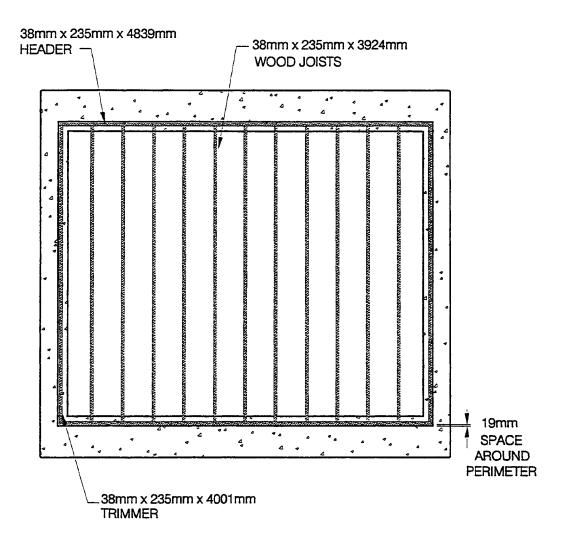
Layout for joists 406 mm o.c. with joist on mid-line of the floor opening — 13 joists.
